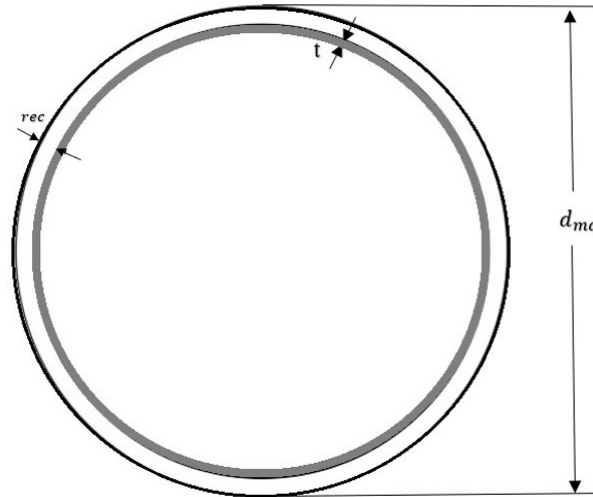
Idealized reinforced circular concrete column cross section. Own made drawing.
